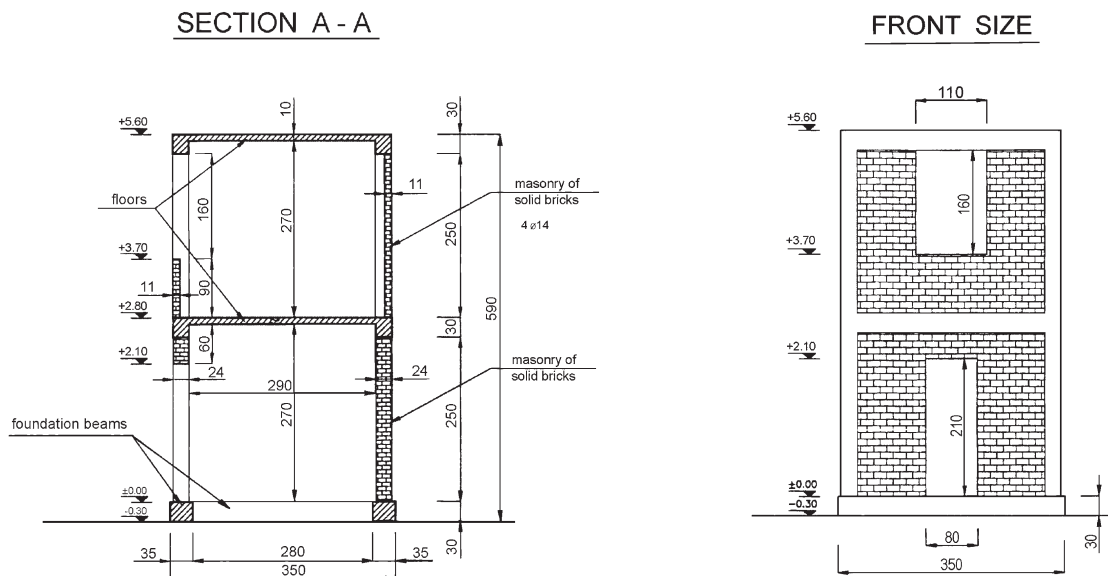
R/C frame model with masonry infills - vertical section and front elevation
